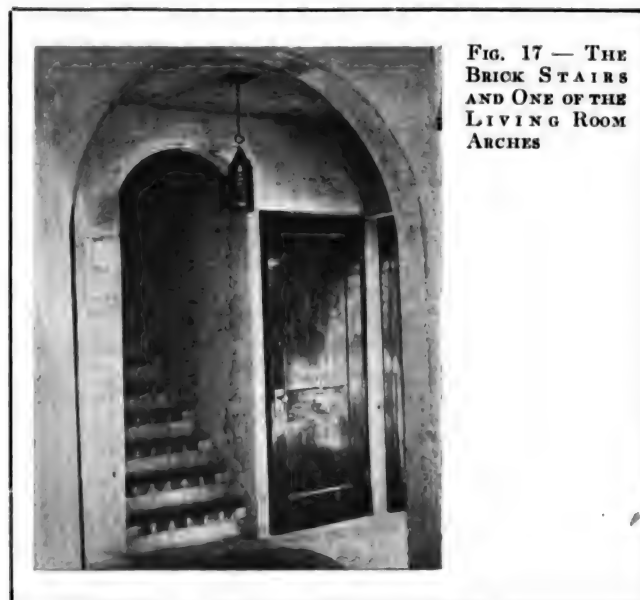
THE BRICK STAIRS AND ONE OF THE LIVING ROOM ARCHES
